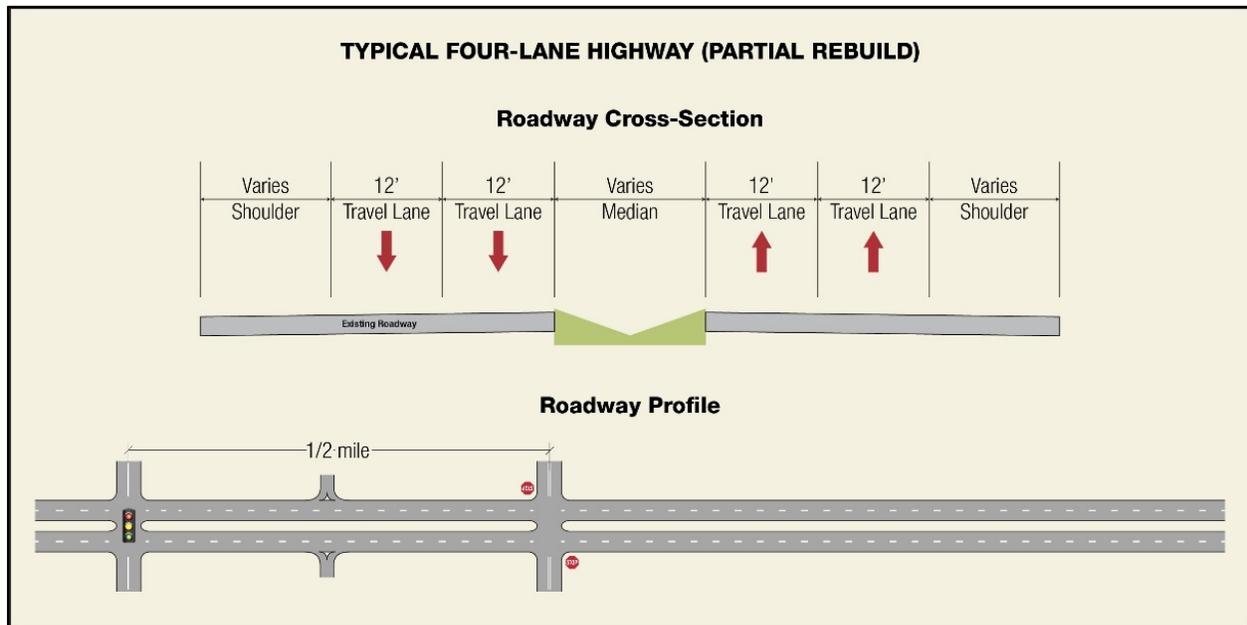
Typical Four-Lane Highway (Partial Rebuild) Roadway Profile and Cross-Section
